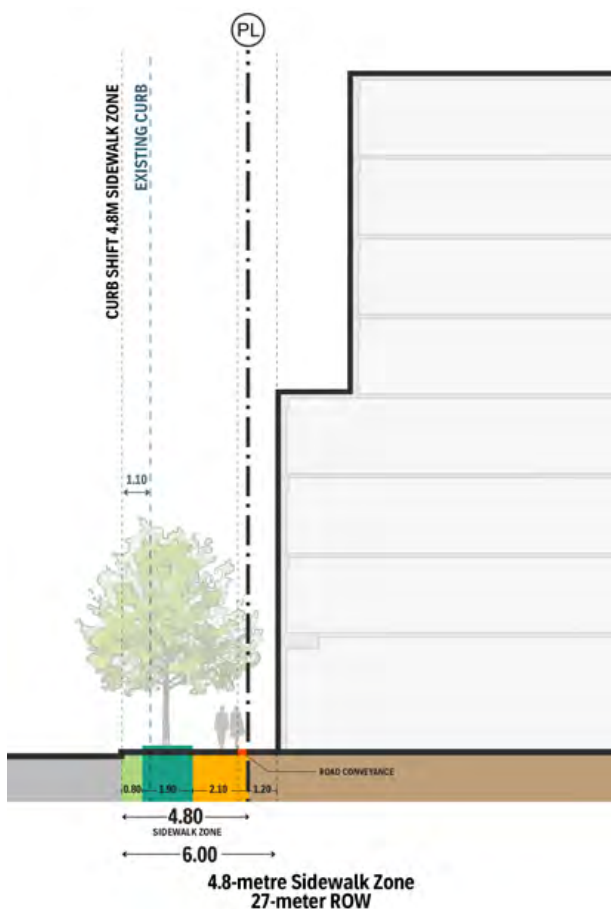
Sidewalk zone details, Source: Complete Street Guidelines
